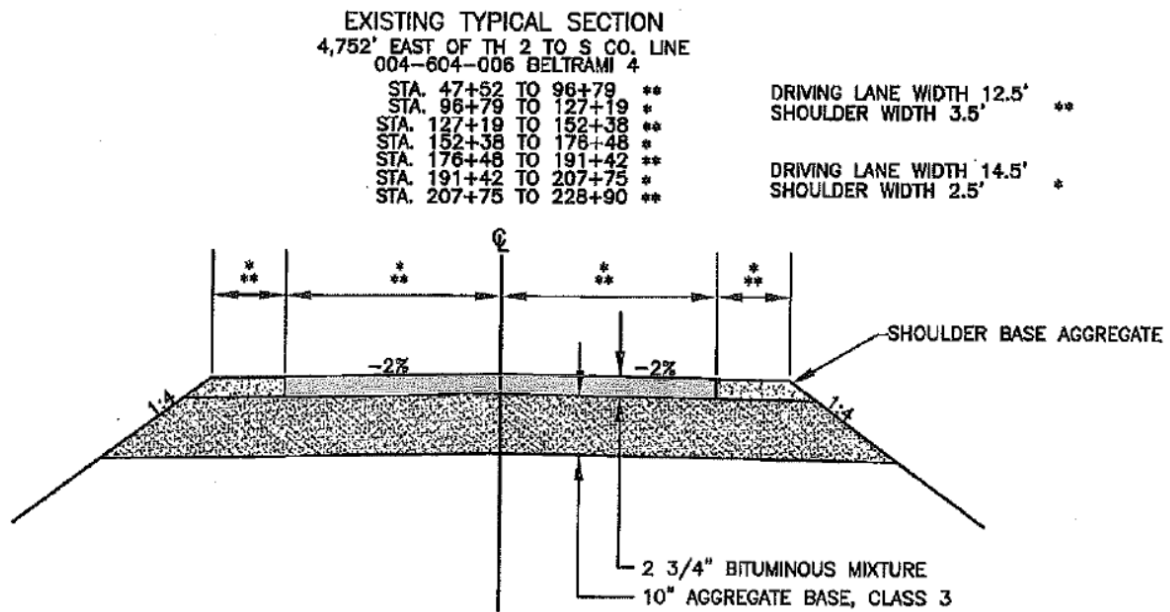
Beltrami CSAH 4 Existing Typical Section
